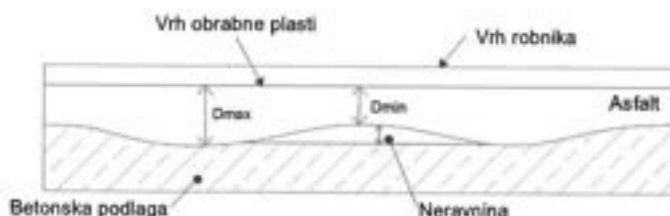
unevenness of the concrete slab – determination of the thickness of asphalt pavement
